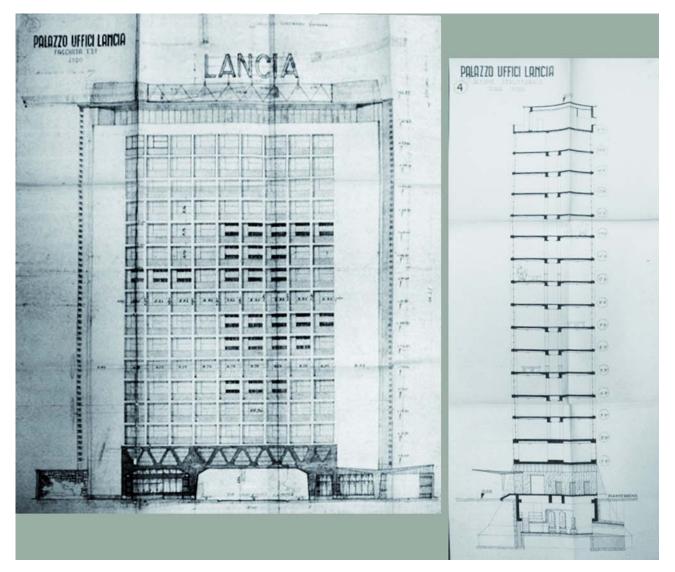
Lancia Office Building, 1954, elevation and cross section (Laboratorio Beni Culturali - Politecnico di Torino)
